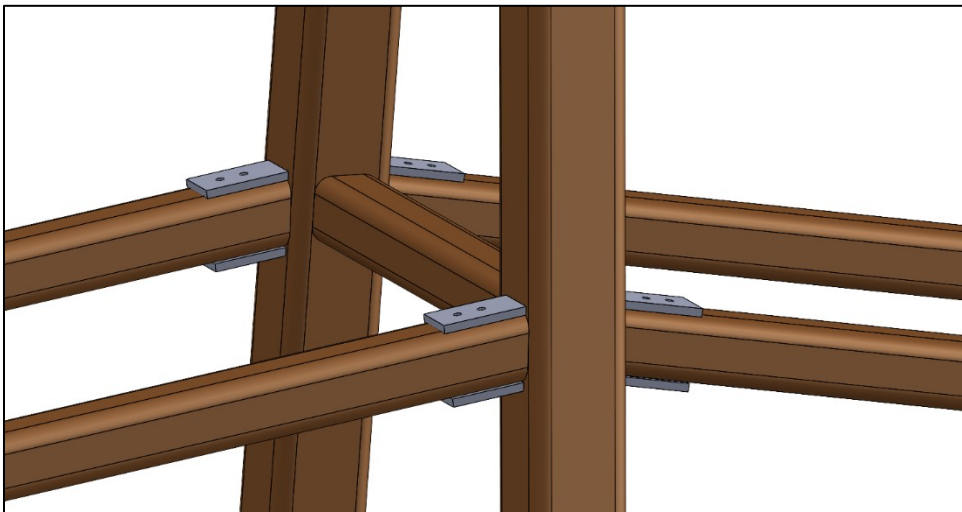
Middle Ring Bolted Connection from Full Assembly
